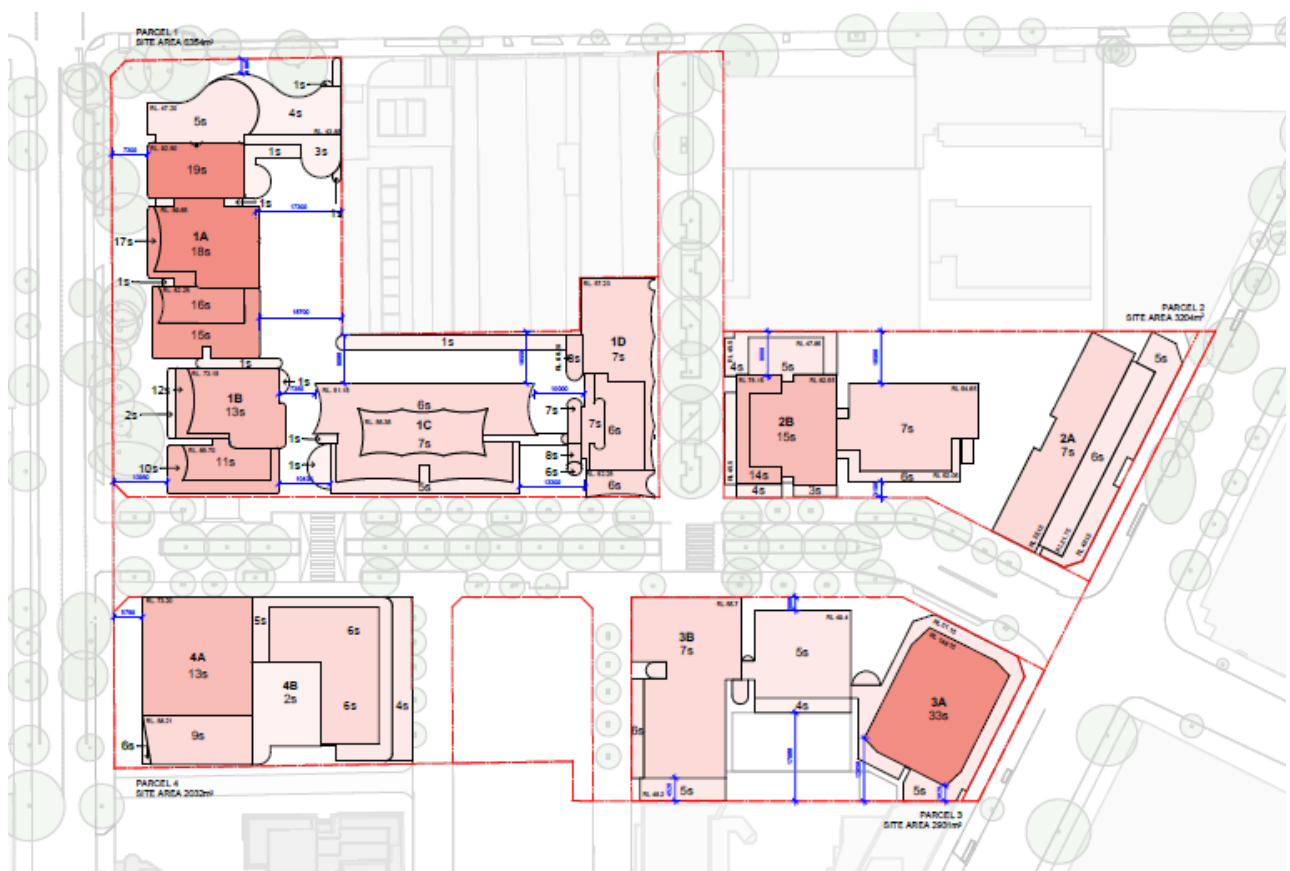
Precinct layout plan showing separation, height in storeys (amended)
